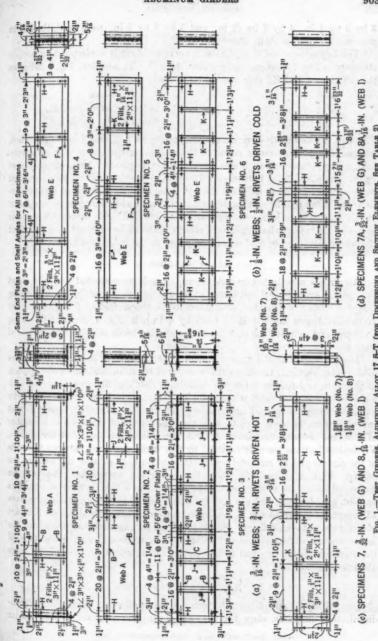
Ther Girders, Aluminum Alloy 17 S-T (for Dimensions and Section Elements, See Table 2)
